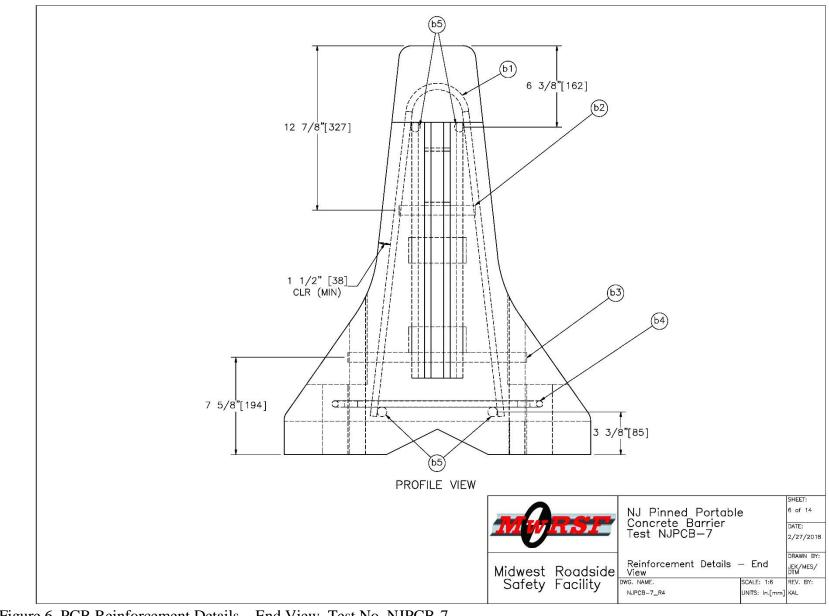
PCB Reinforcement Details – End View, Test No. NJPCB-7
